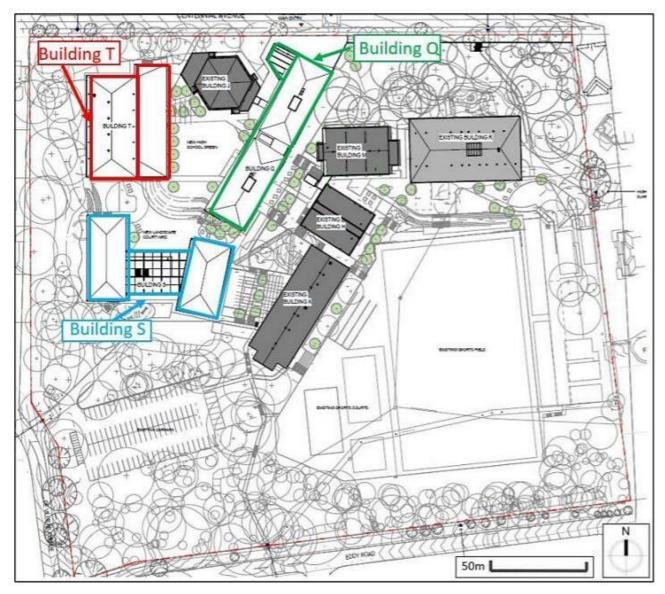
Chatswood High School Site Plan (Source: EIS 2020)
